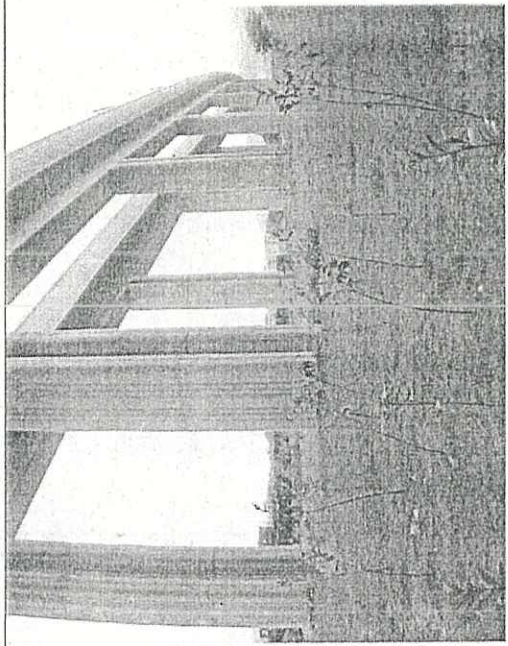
Landscape Planting between Tin Shui Wai & Shek Po Tsuen (Piers 826-826)
